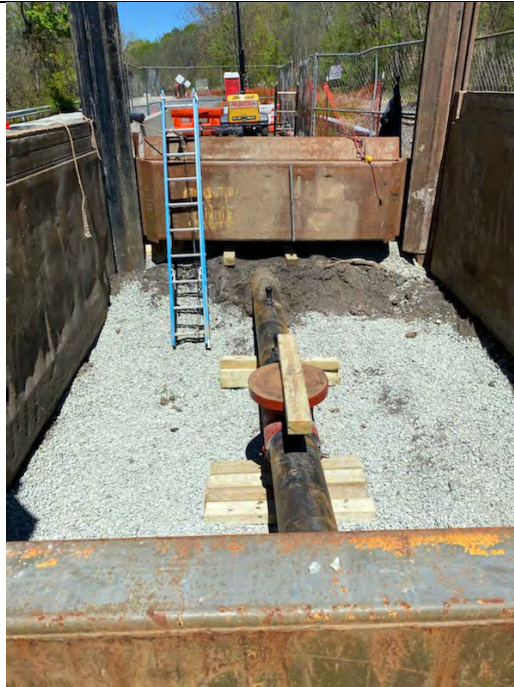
View looking north. Addition of NYSDOT No. 2 stone within excavation around pre-existing gas transmission line to facilitate welding and cutting activities on CSX property at the southern tie-in location (vicinity of Sta. 31+45). (Photo Taken 5/5/2022).
